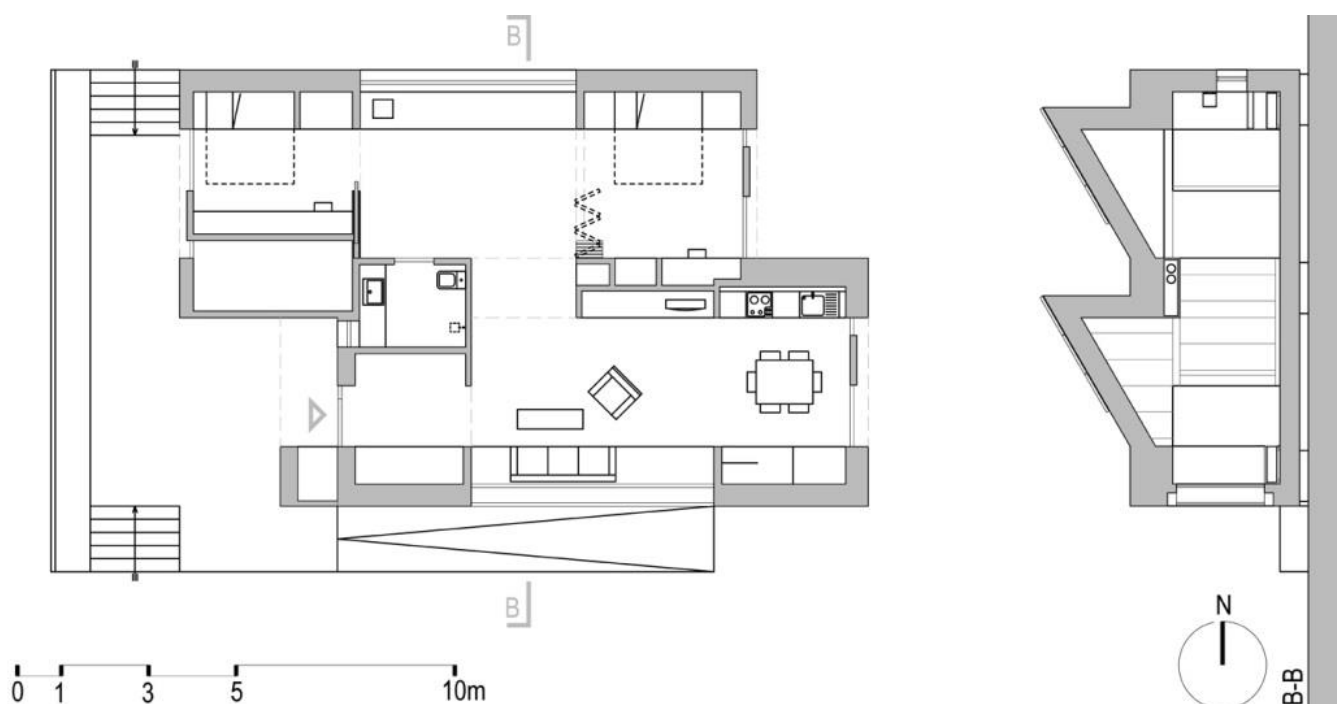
Plan and vertical section of the ZEB Living Lab [17].
